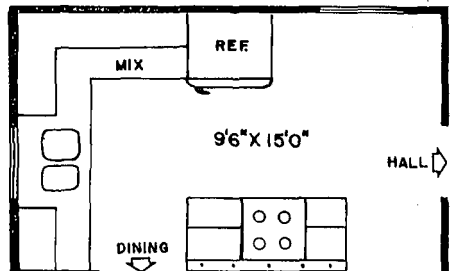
Broken U using a half wall back of the cooking and serving center to separate the kitchen work area from the dining area (open planning).
